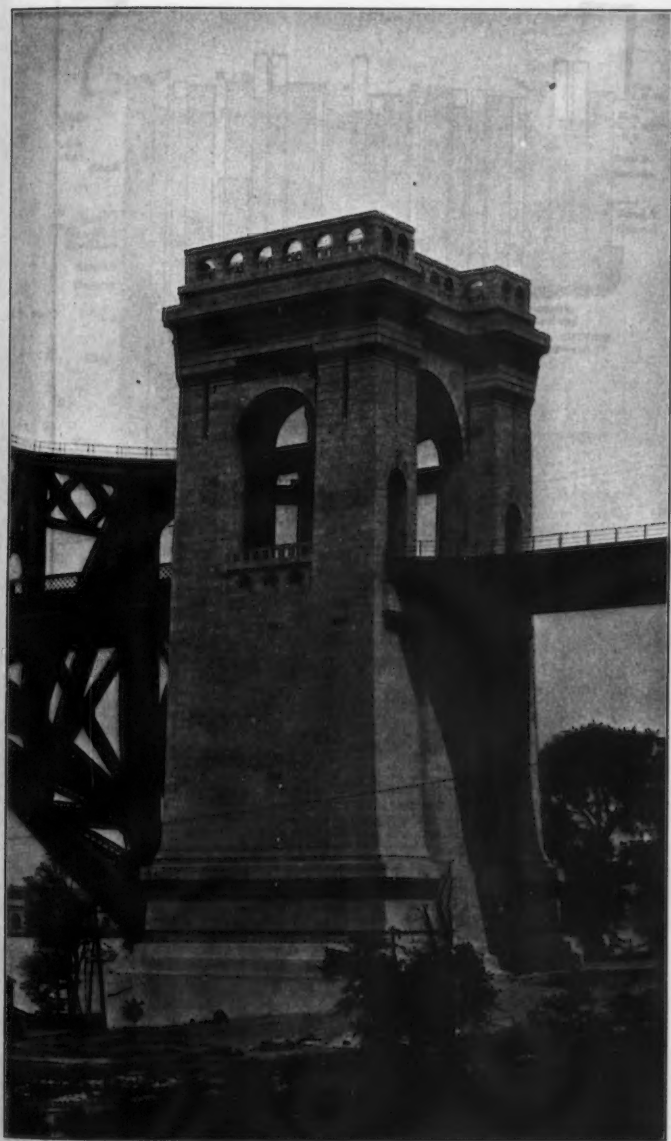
LONG ISLAND TOWER OF HELL GATE BRIDGE.
